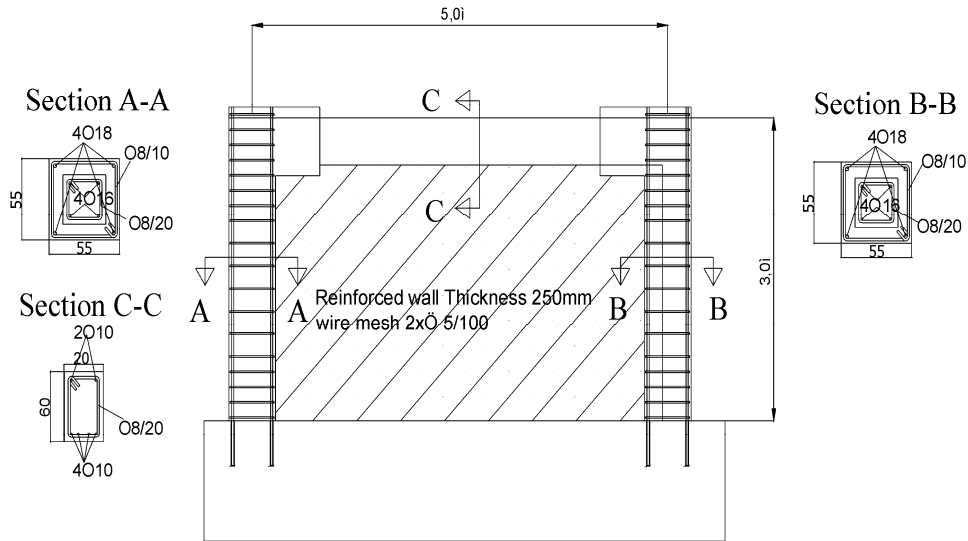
Typical base storey retrofitted frame with the columns' jackets and strengthened infill panel with reinforced plaster.
